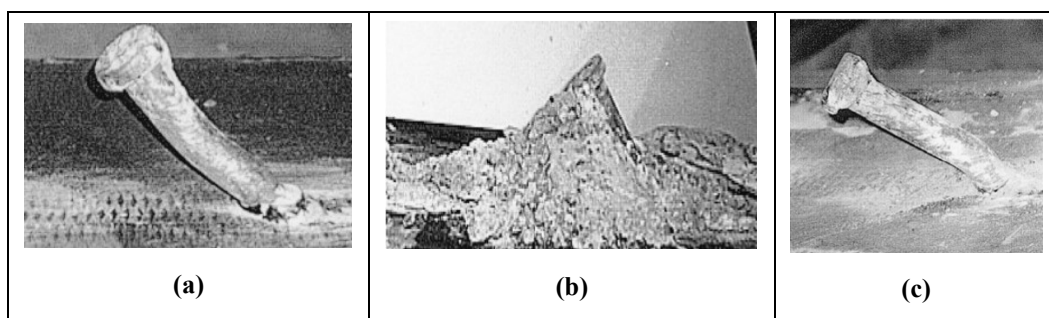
Different failure mechanism of the shear studs, (a) weld failure, (b) concrete failure, (c) ductile failure.
